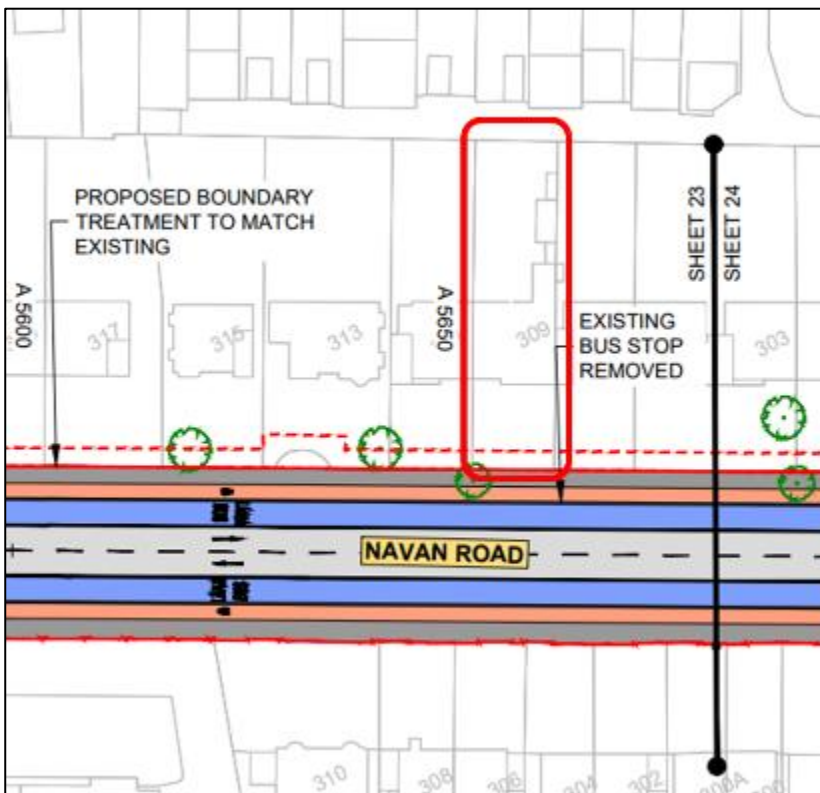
Proposed new Layout at 309 Navan Road
